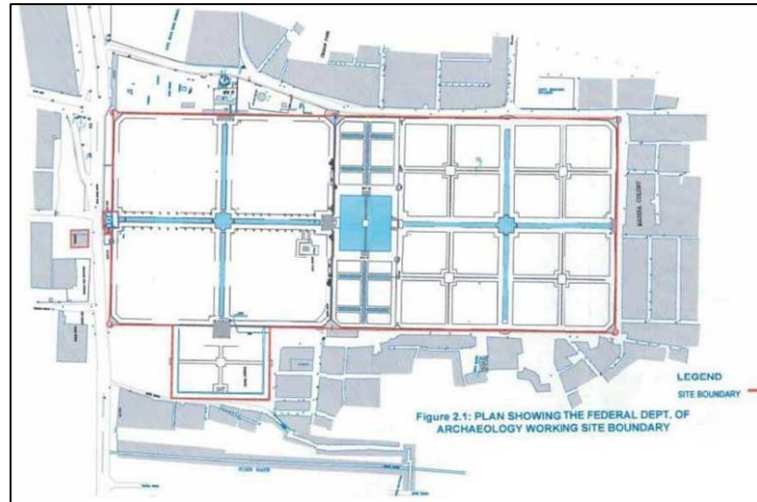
Plan of Shalimar Garden Site under Federal Department (UNESCO, 2024)
